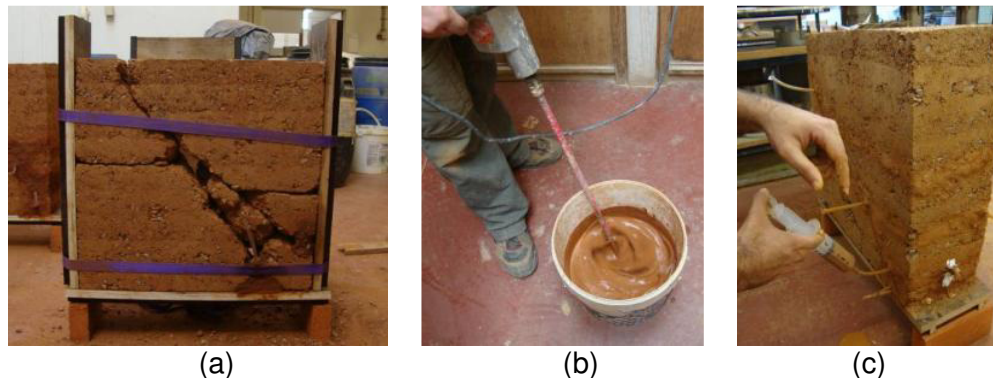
Repair of the wallets by grout injection: (a) remounting of a wallet; (b) grout mixing; (c) injection of the grout.
